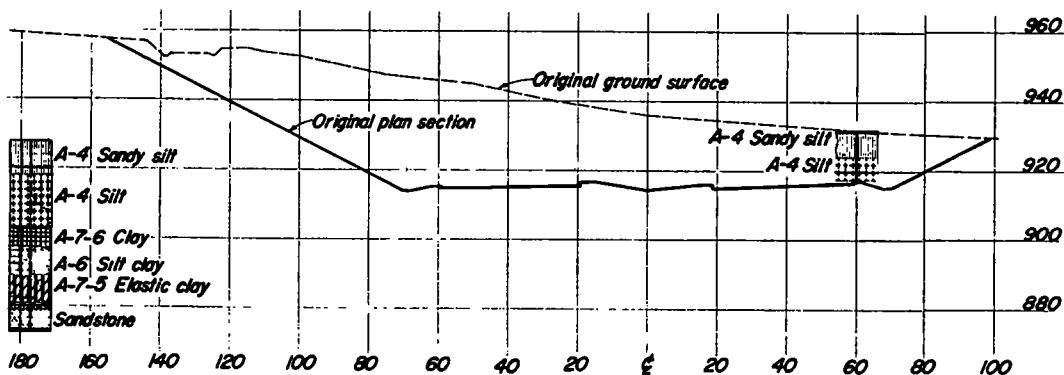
Cross-section of proposed cut, showing original ground surface, original plan section, and logs of borings for roadway subsurface investigation.
